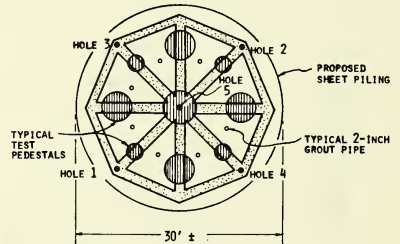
DETAILS OF HOLLOW SHIELDED SLAB
